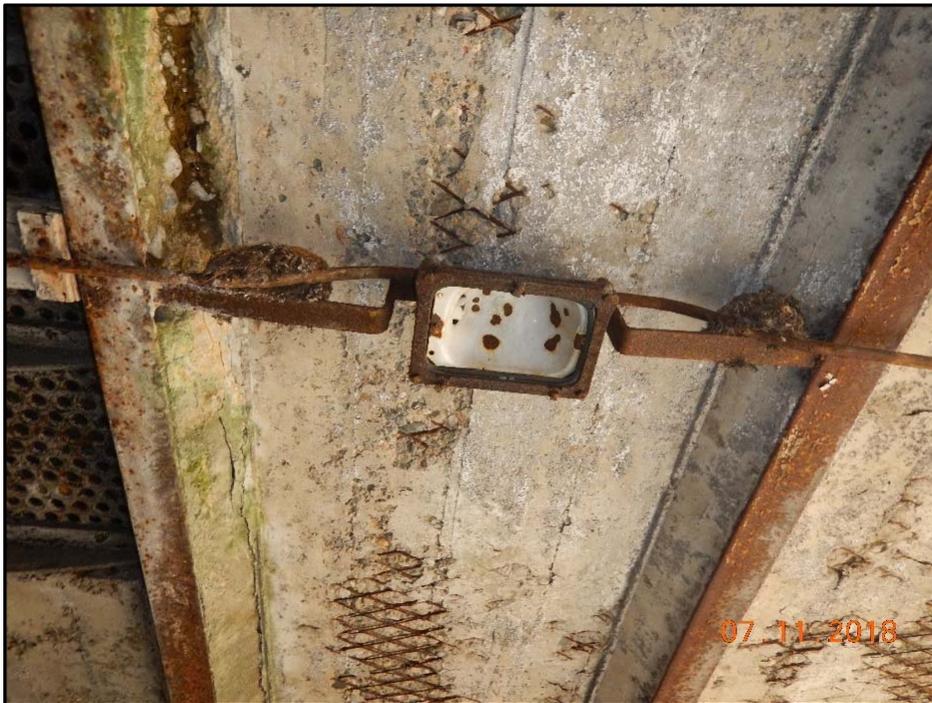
Typical broken light fixtures (shown near south entrance).
